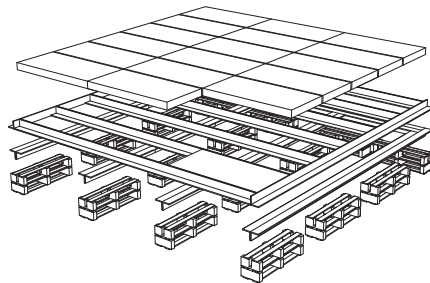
Exploded axonometric view of foundation and floor structure
